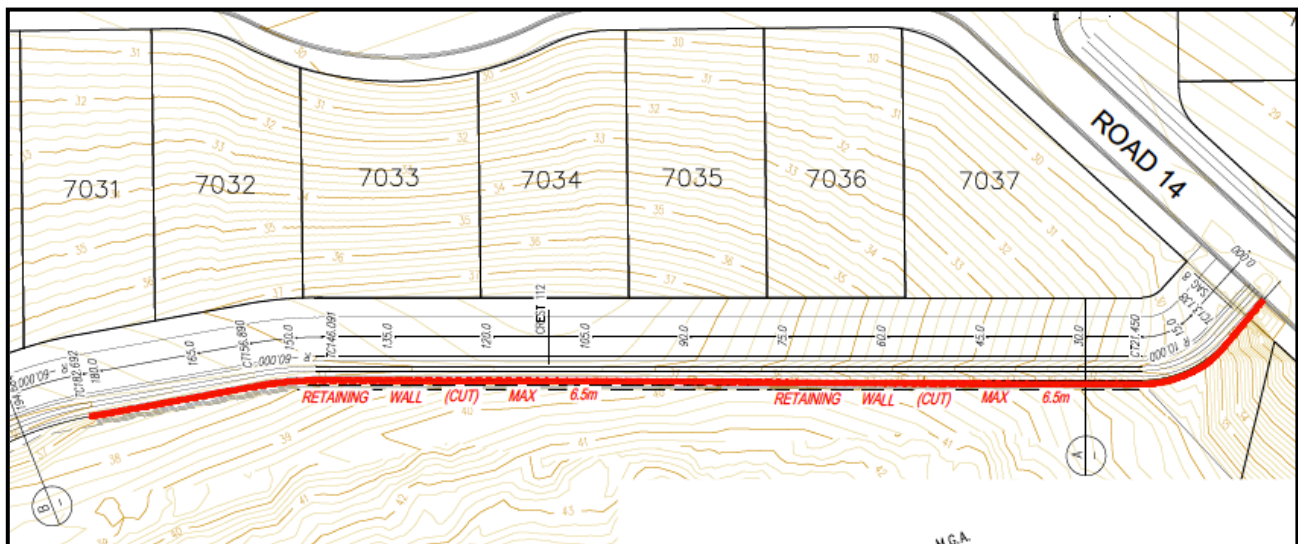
Location of approved road sections requiring 6.5 metre high retaining walls.
